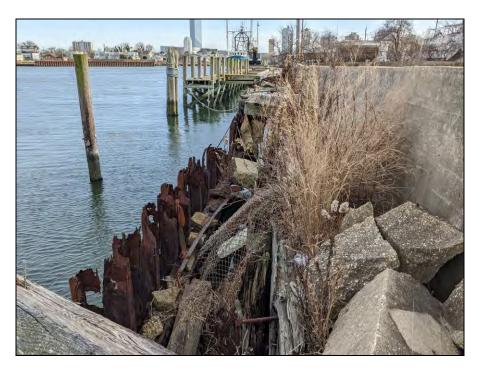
View of dilapidated waterfront showing concrete rubble, fencing, bulkhead and moorings
